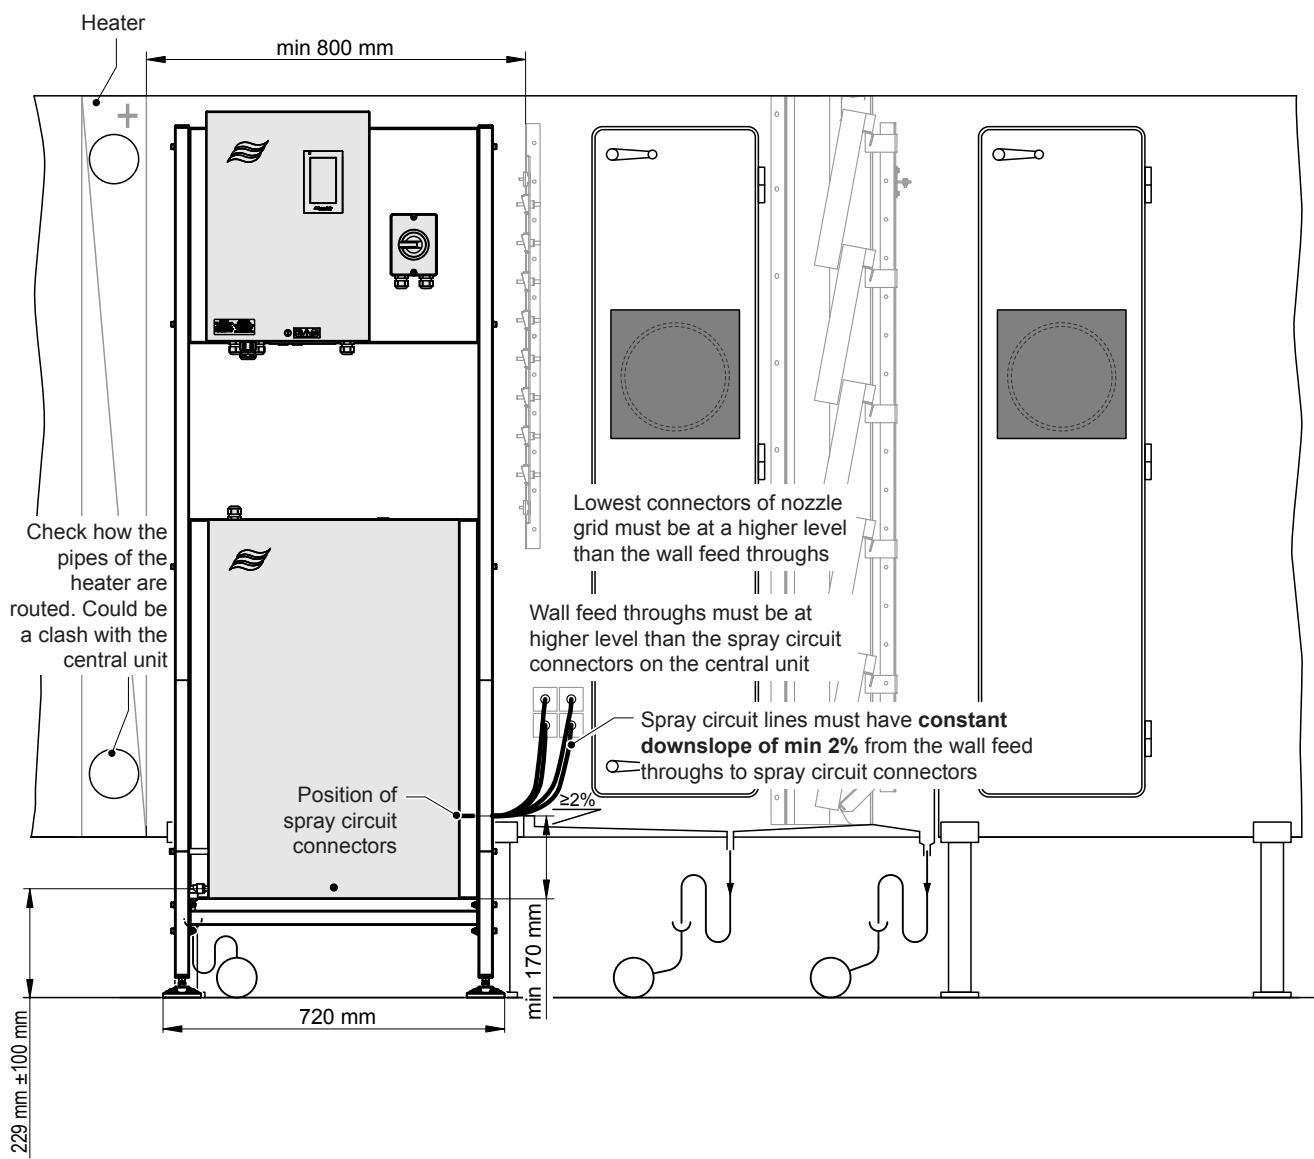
Example 1: Positioning the mounting rack before the nozzle grid
